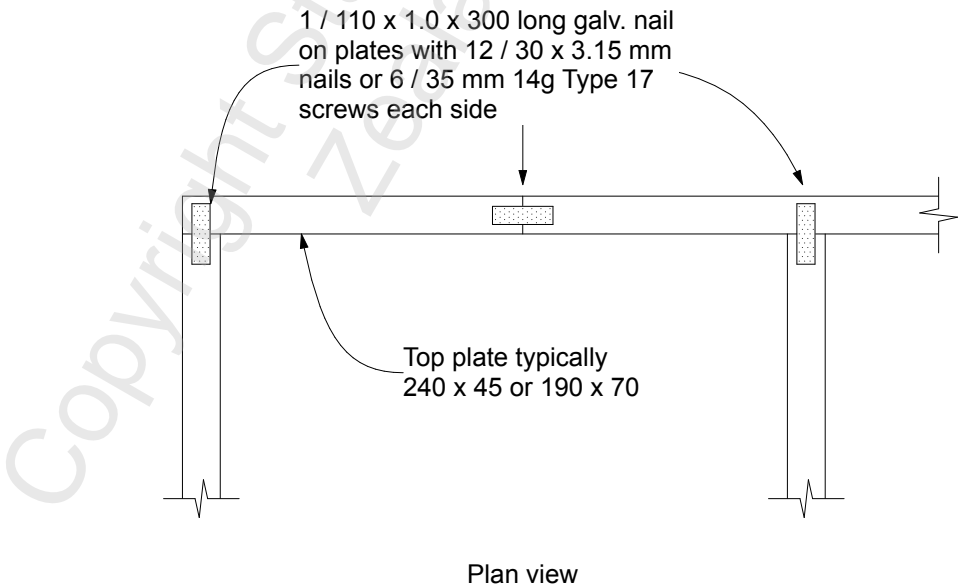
Connection of timber bond beams or top plates with structural diaphragms (plan)
